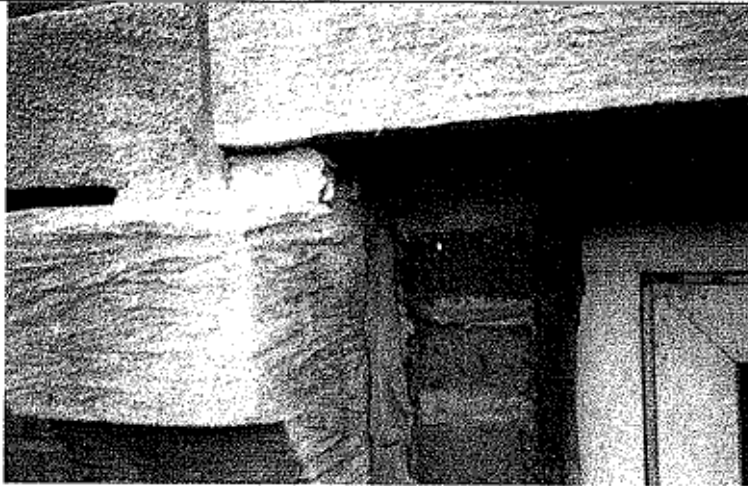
Cracked, weathered and opened mortar joints at limestone elements.
